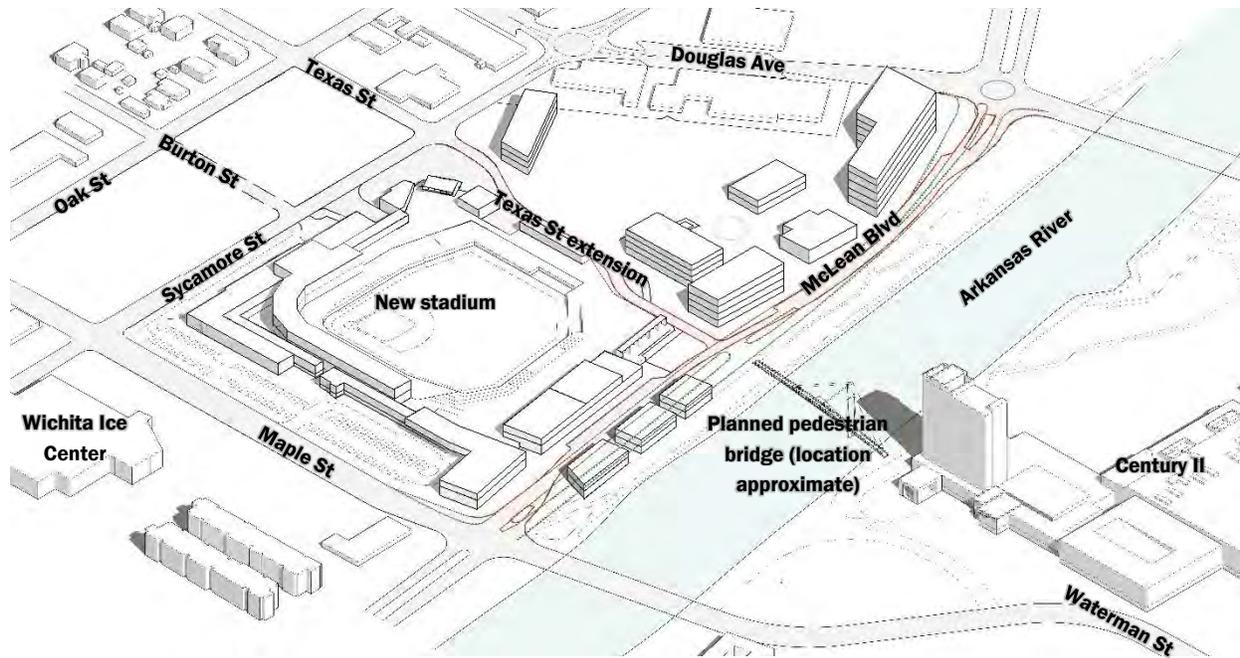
Street network changes consist of a reconstruction of McLean Boulevard, and extension of Texas Street to meet McLean and the planned pedestrian bridge across the Arkansas River. The diagram above illustrates a possible alignment for the Texas Street extension. The extension curves so it can be entirely located on the stadium site. Solid red lines indicate new alignments; solid green lines indicate the existing McLean Boulevard alignment.
